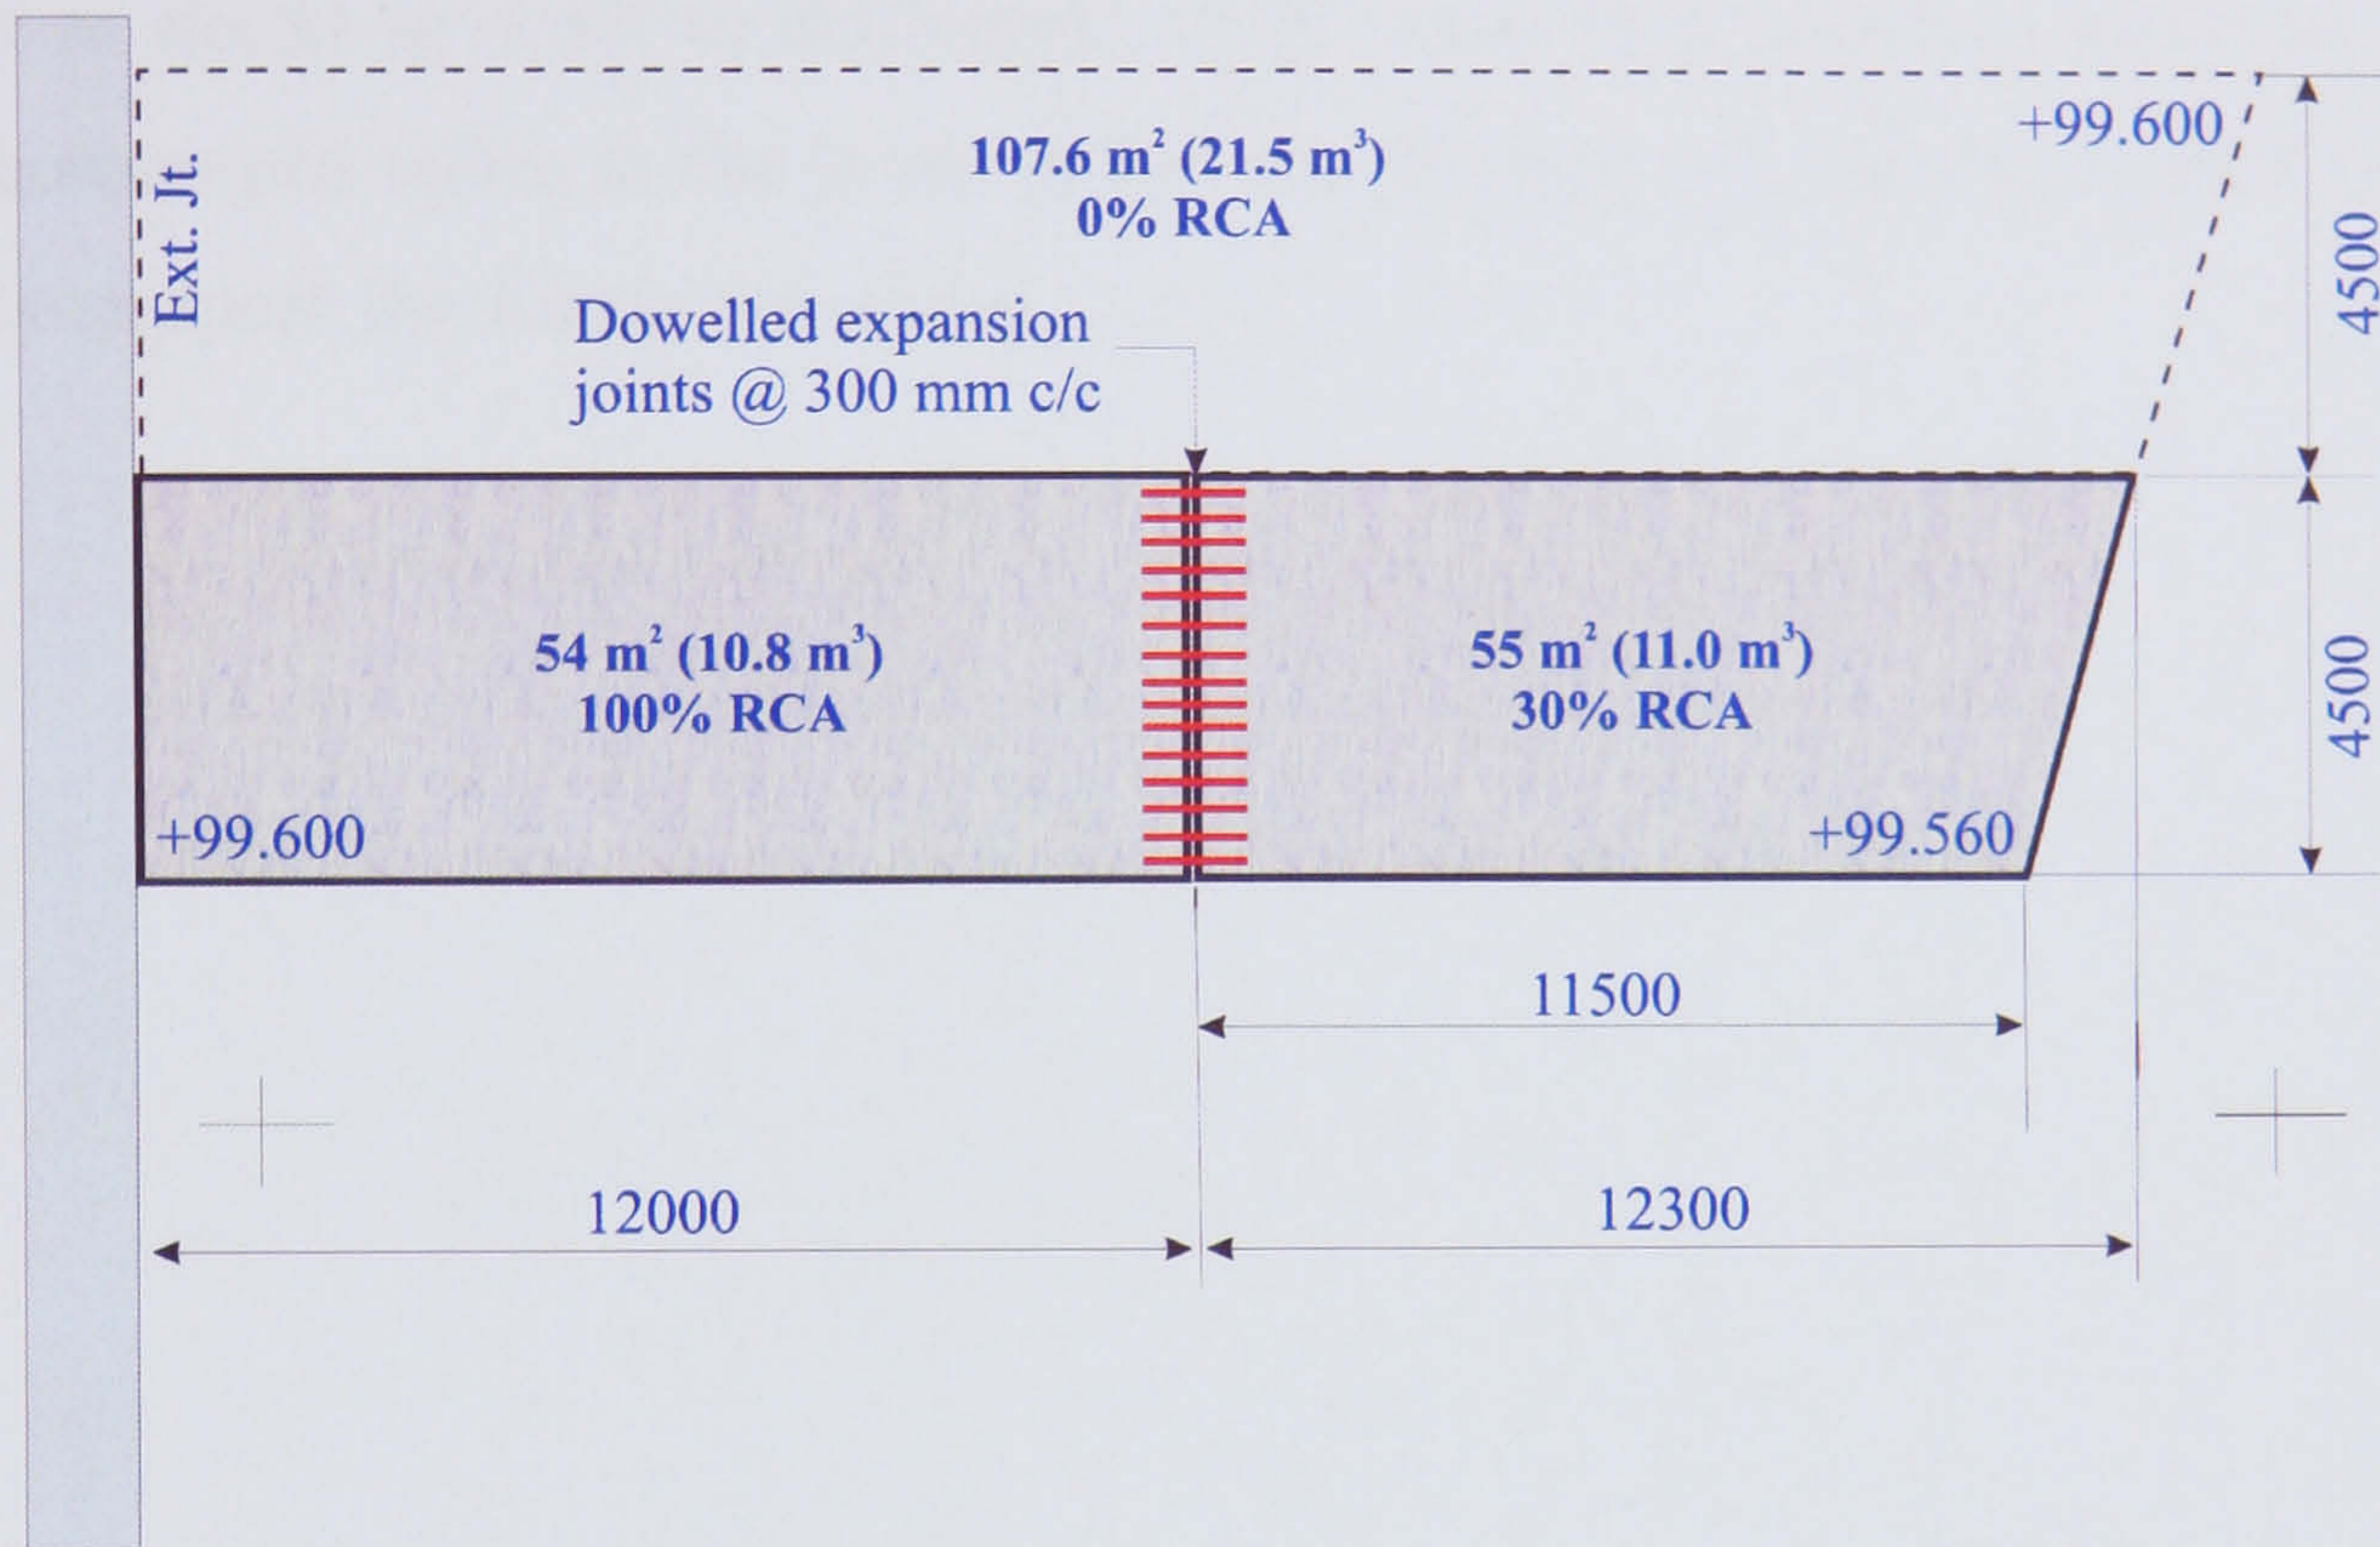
Plan showing the predefined concrete pavement strips constructed during the second demonstration.
